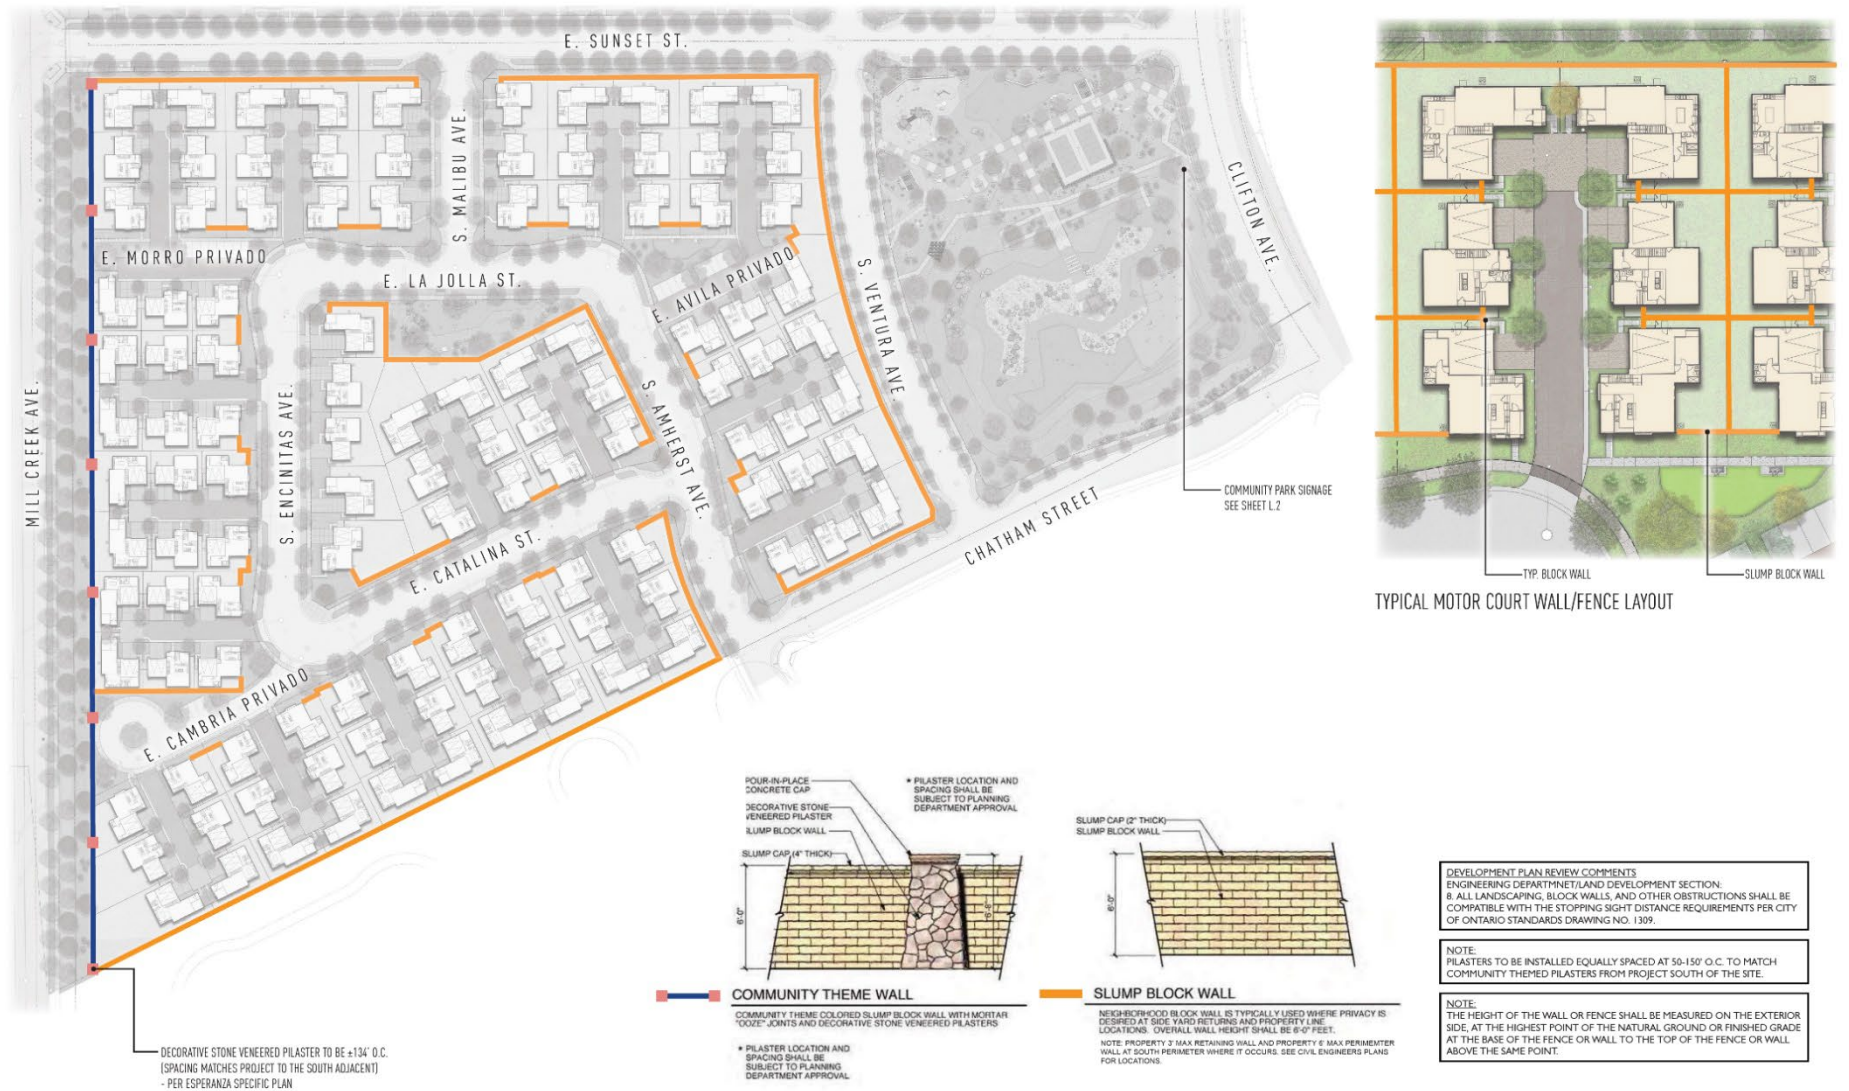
ROW TOWNHOMES LANDSCAPE PLAN
